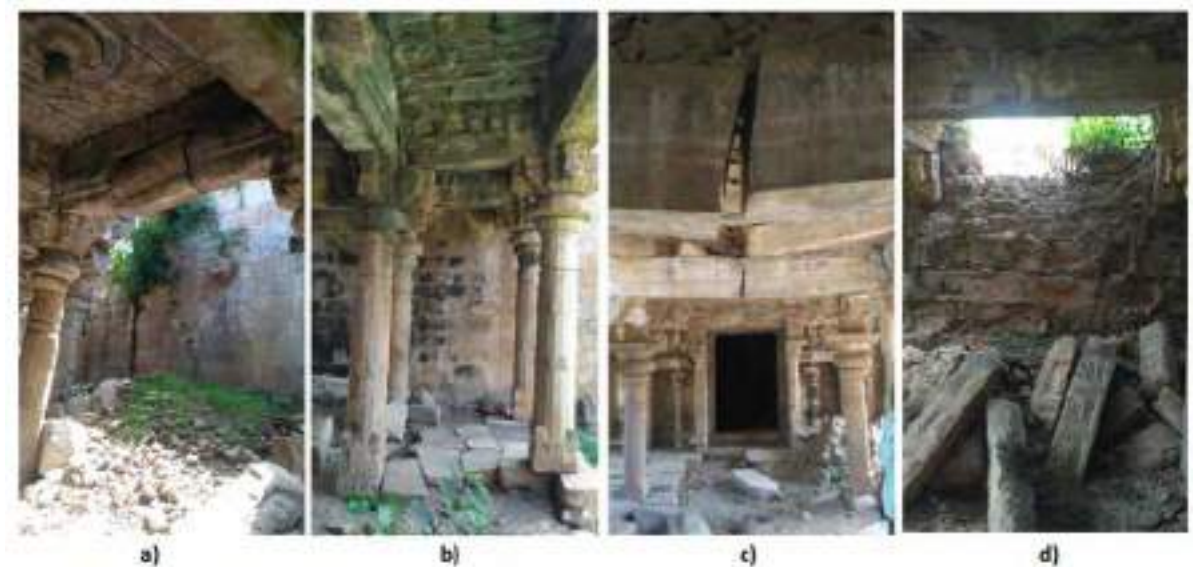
Illustration of the condition of structure. (a) Fallen roof, (b) skewed pillars, (c) cracked beams, (d) collapsed stone veneer of three-leaf wall.
